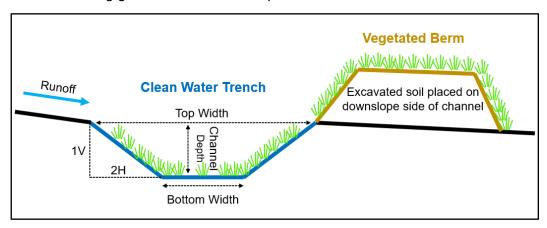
Proposed Khulu TSF clean water diversion trench design
